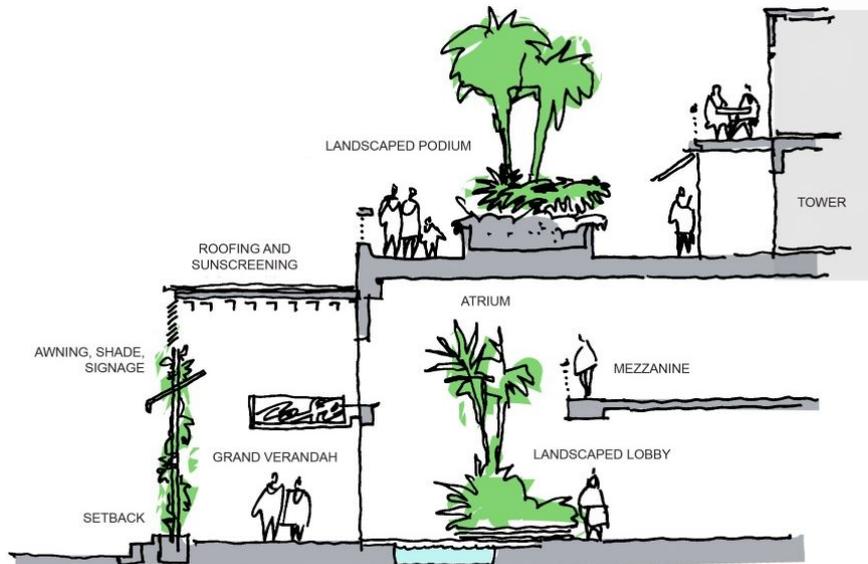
d – Street canopy (typical cross section)
